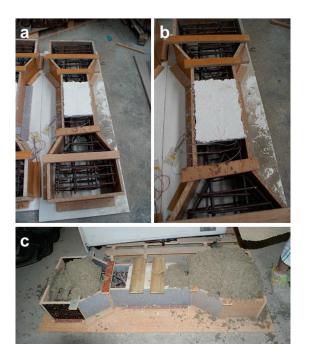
a, b) Specimens' formwork with EPS to simulate the damage; c) Pouring concrete
